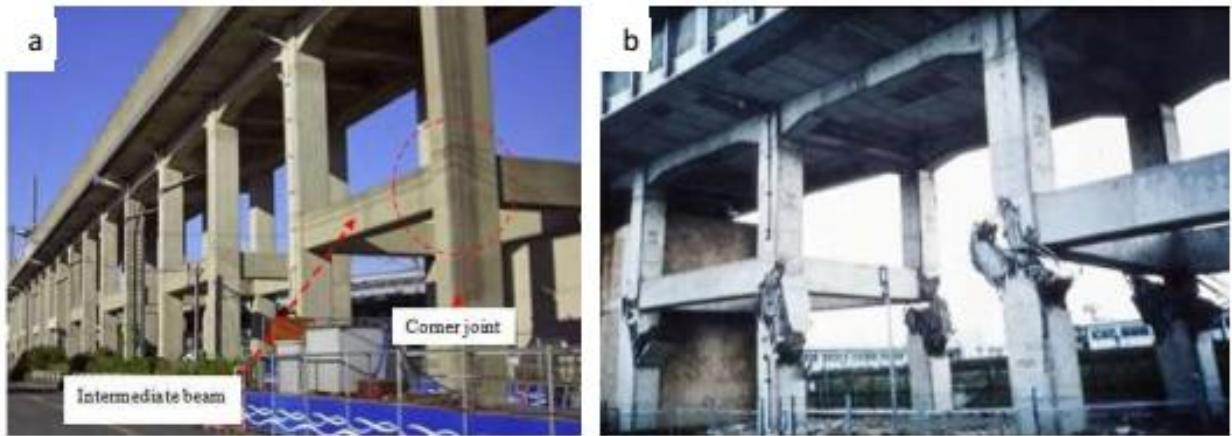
a) Rigid-framed railway bridges [15],b) collapse the railway bridge due to the Kobe earthquake/Japan.
